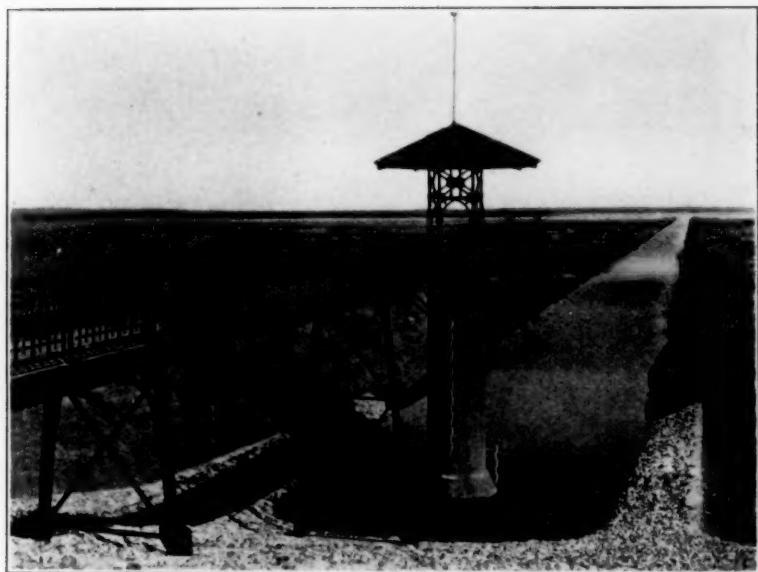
PLATE VI.—Outlet tower, Hondo reservoir, New Mexico.
